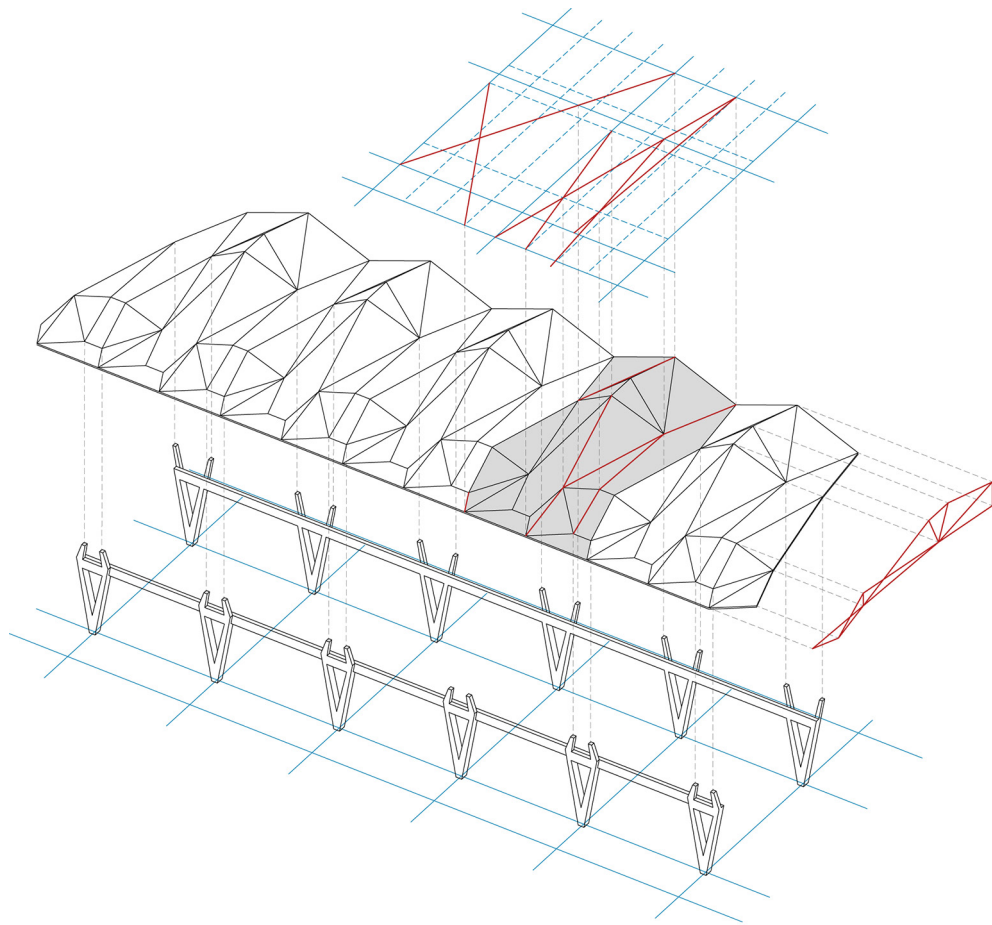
Stabilimento Raffo in Pietrasanta (1956). Axonometric diagram of the roof constructed from the projections of the roof in plan and elevation (D'Acunto and Ingold 2016).
